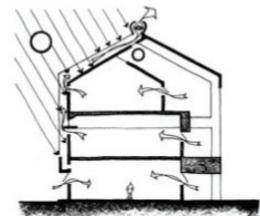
, Stack and wind ventilation through roof system (Florida A&M School of architecture).
